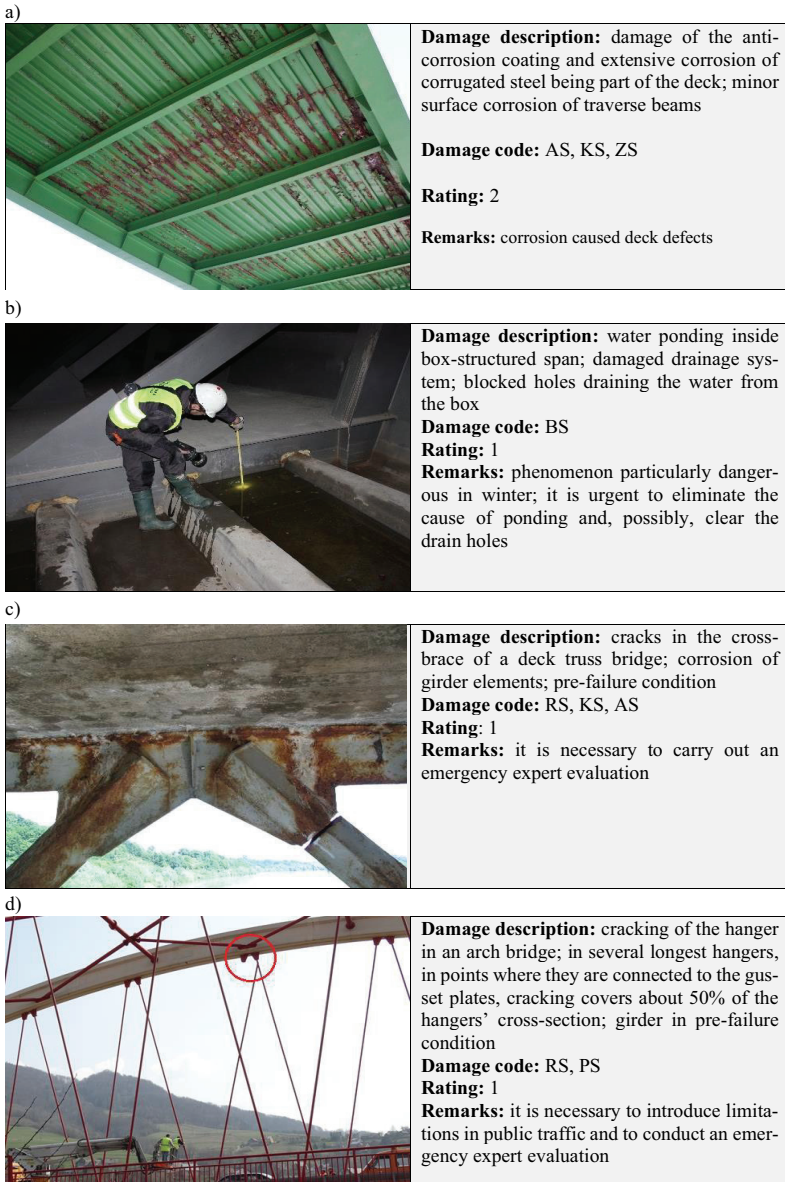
Examples of assessment of technical condition with damage description, damage code, rating, and remarks: (a) deck corrosion, (b) faulty drainage and water ponding in a box structure, (c) cracks in the cross-brace of a truss bridge, (d) cracking of the hanger in an arch bridge
